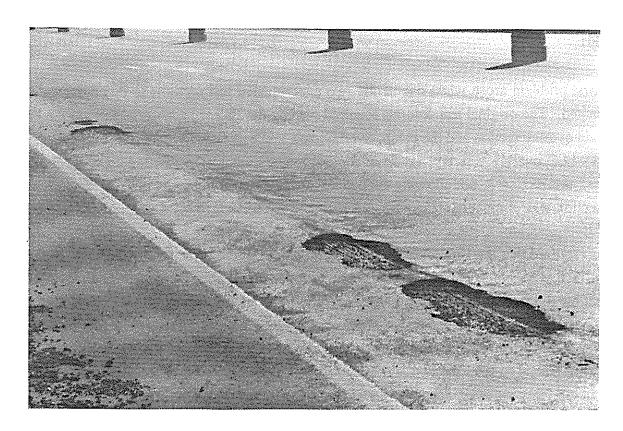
Extreme Raveling and spalling at HaTeLIT Interface.
